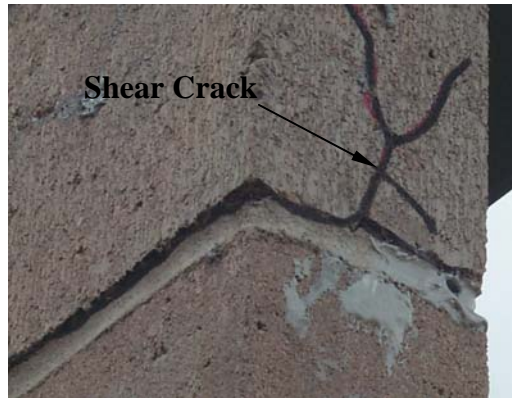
Shear Crack at Top Support of Wall A1 at Event #6
